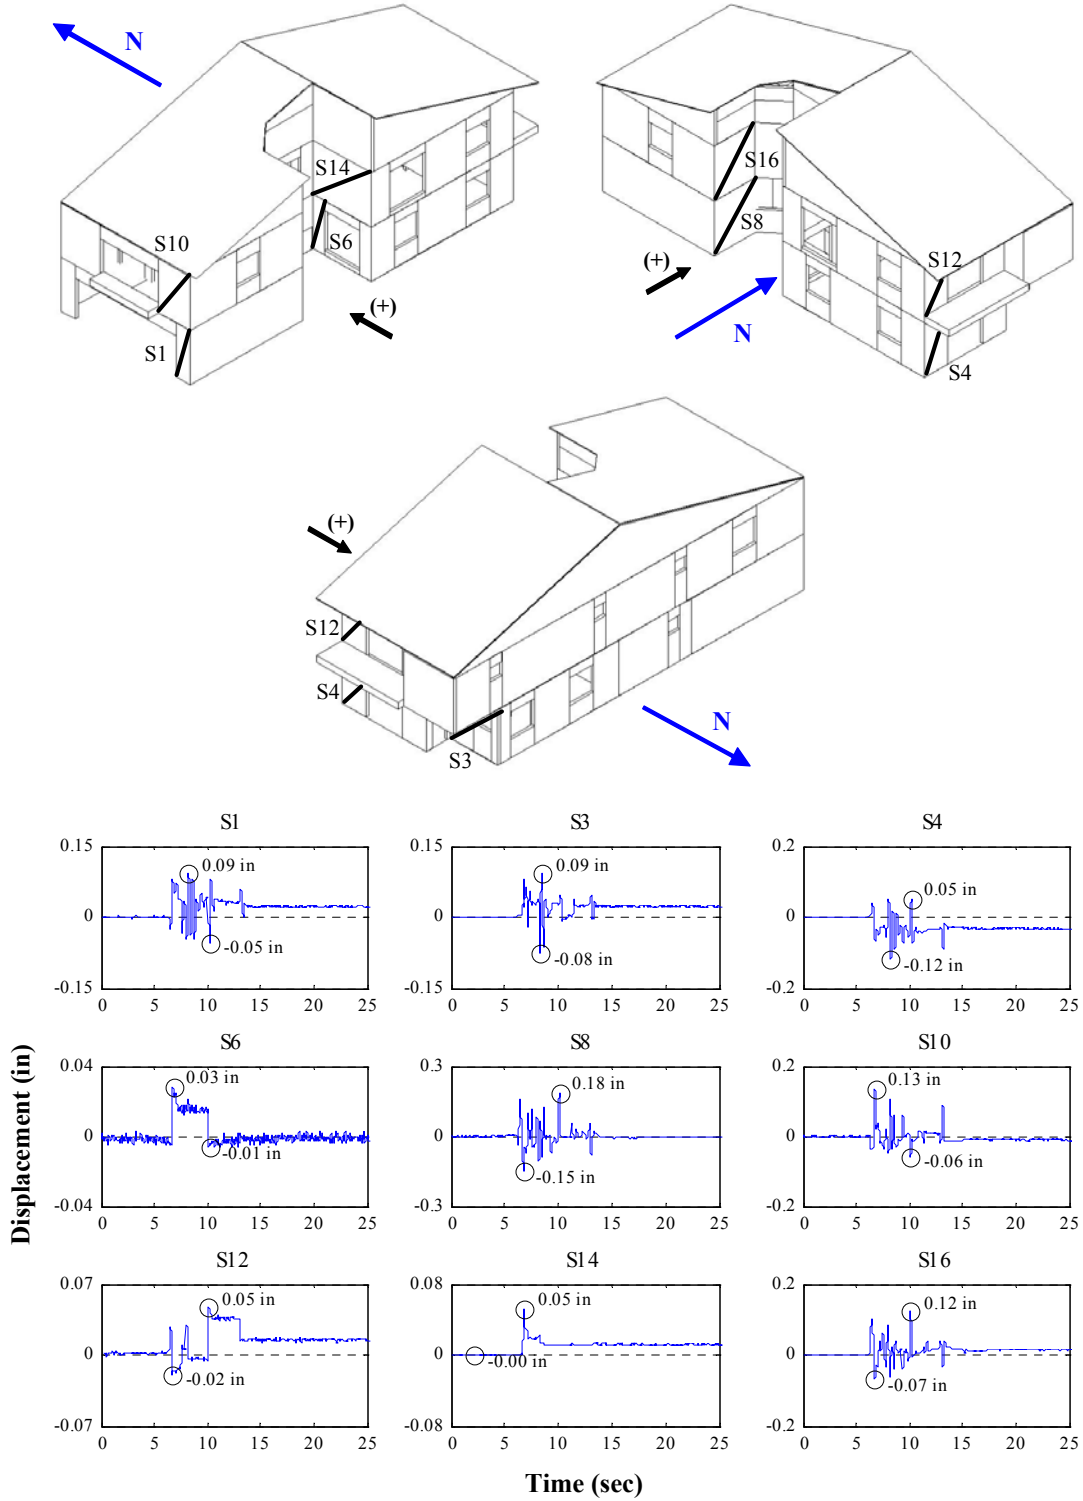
Wall deformations of north-south external walls for Test NWP2S16
